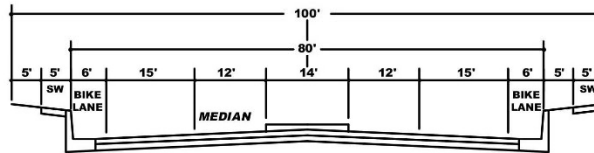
CITY OF LAKE ELSINORE GENERAL PLAN ROADWAY CROSS-SECTIONS
